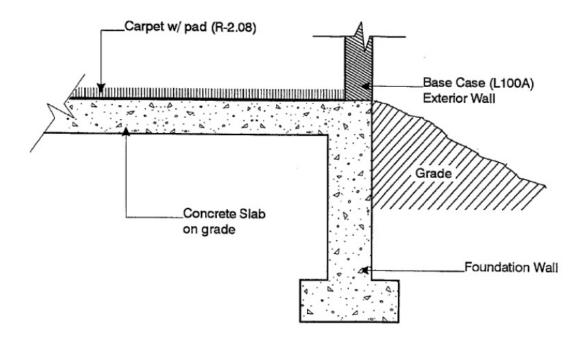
Case L302A Uninsulated Slab-on-Grade Section (ANSI/ASHRAE 2011, Figure 7-20)
